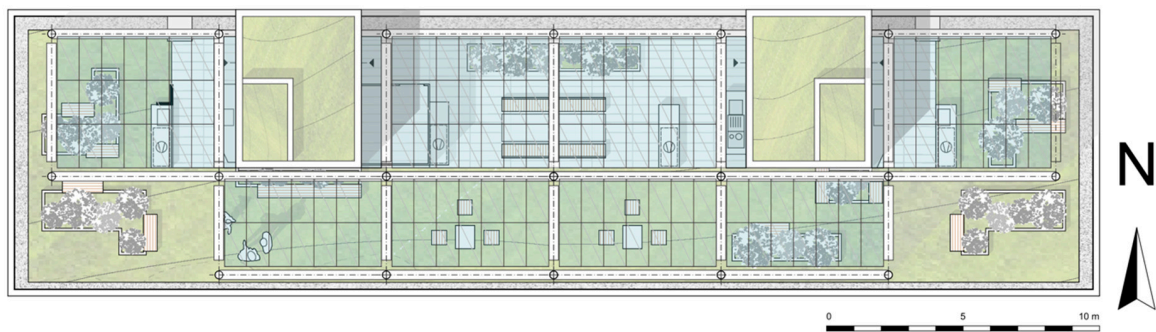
Exemplary floor plan (rooftop view) for a central-staircase residential type.
